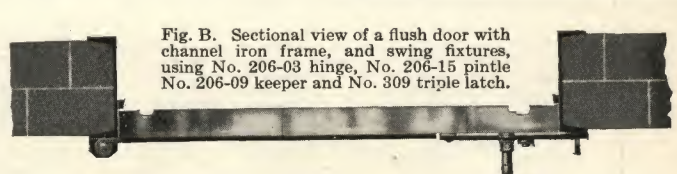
Fig. B. Sectional view of a flush door with channel iron frame, and swing fixtures, using No. 206-03 hinge, No. 206-15 pintle, No. 206-09 keeper and No. 309 triple latch.
